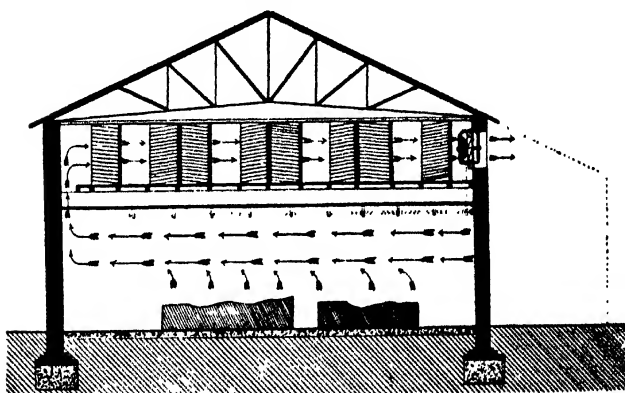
Application of Artificial Withering by means of Waste Heat to an Ordinary Tea House with a Ridged Roof (transverse section).
